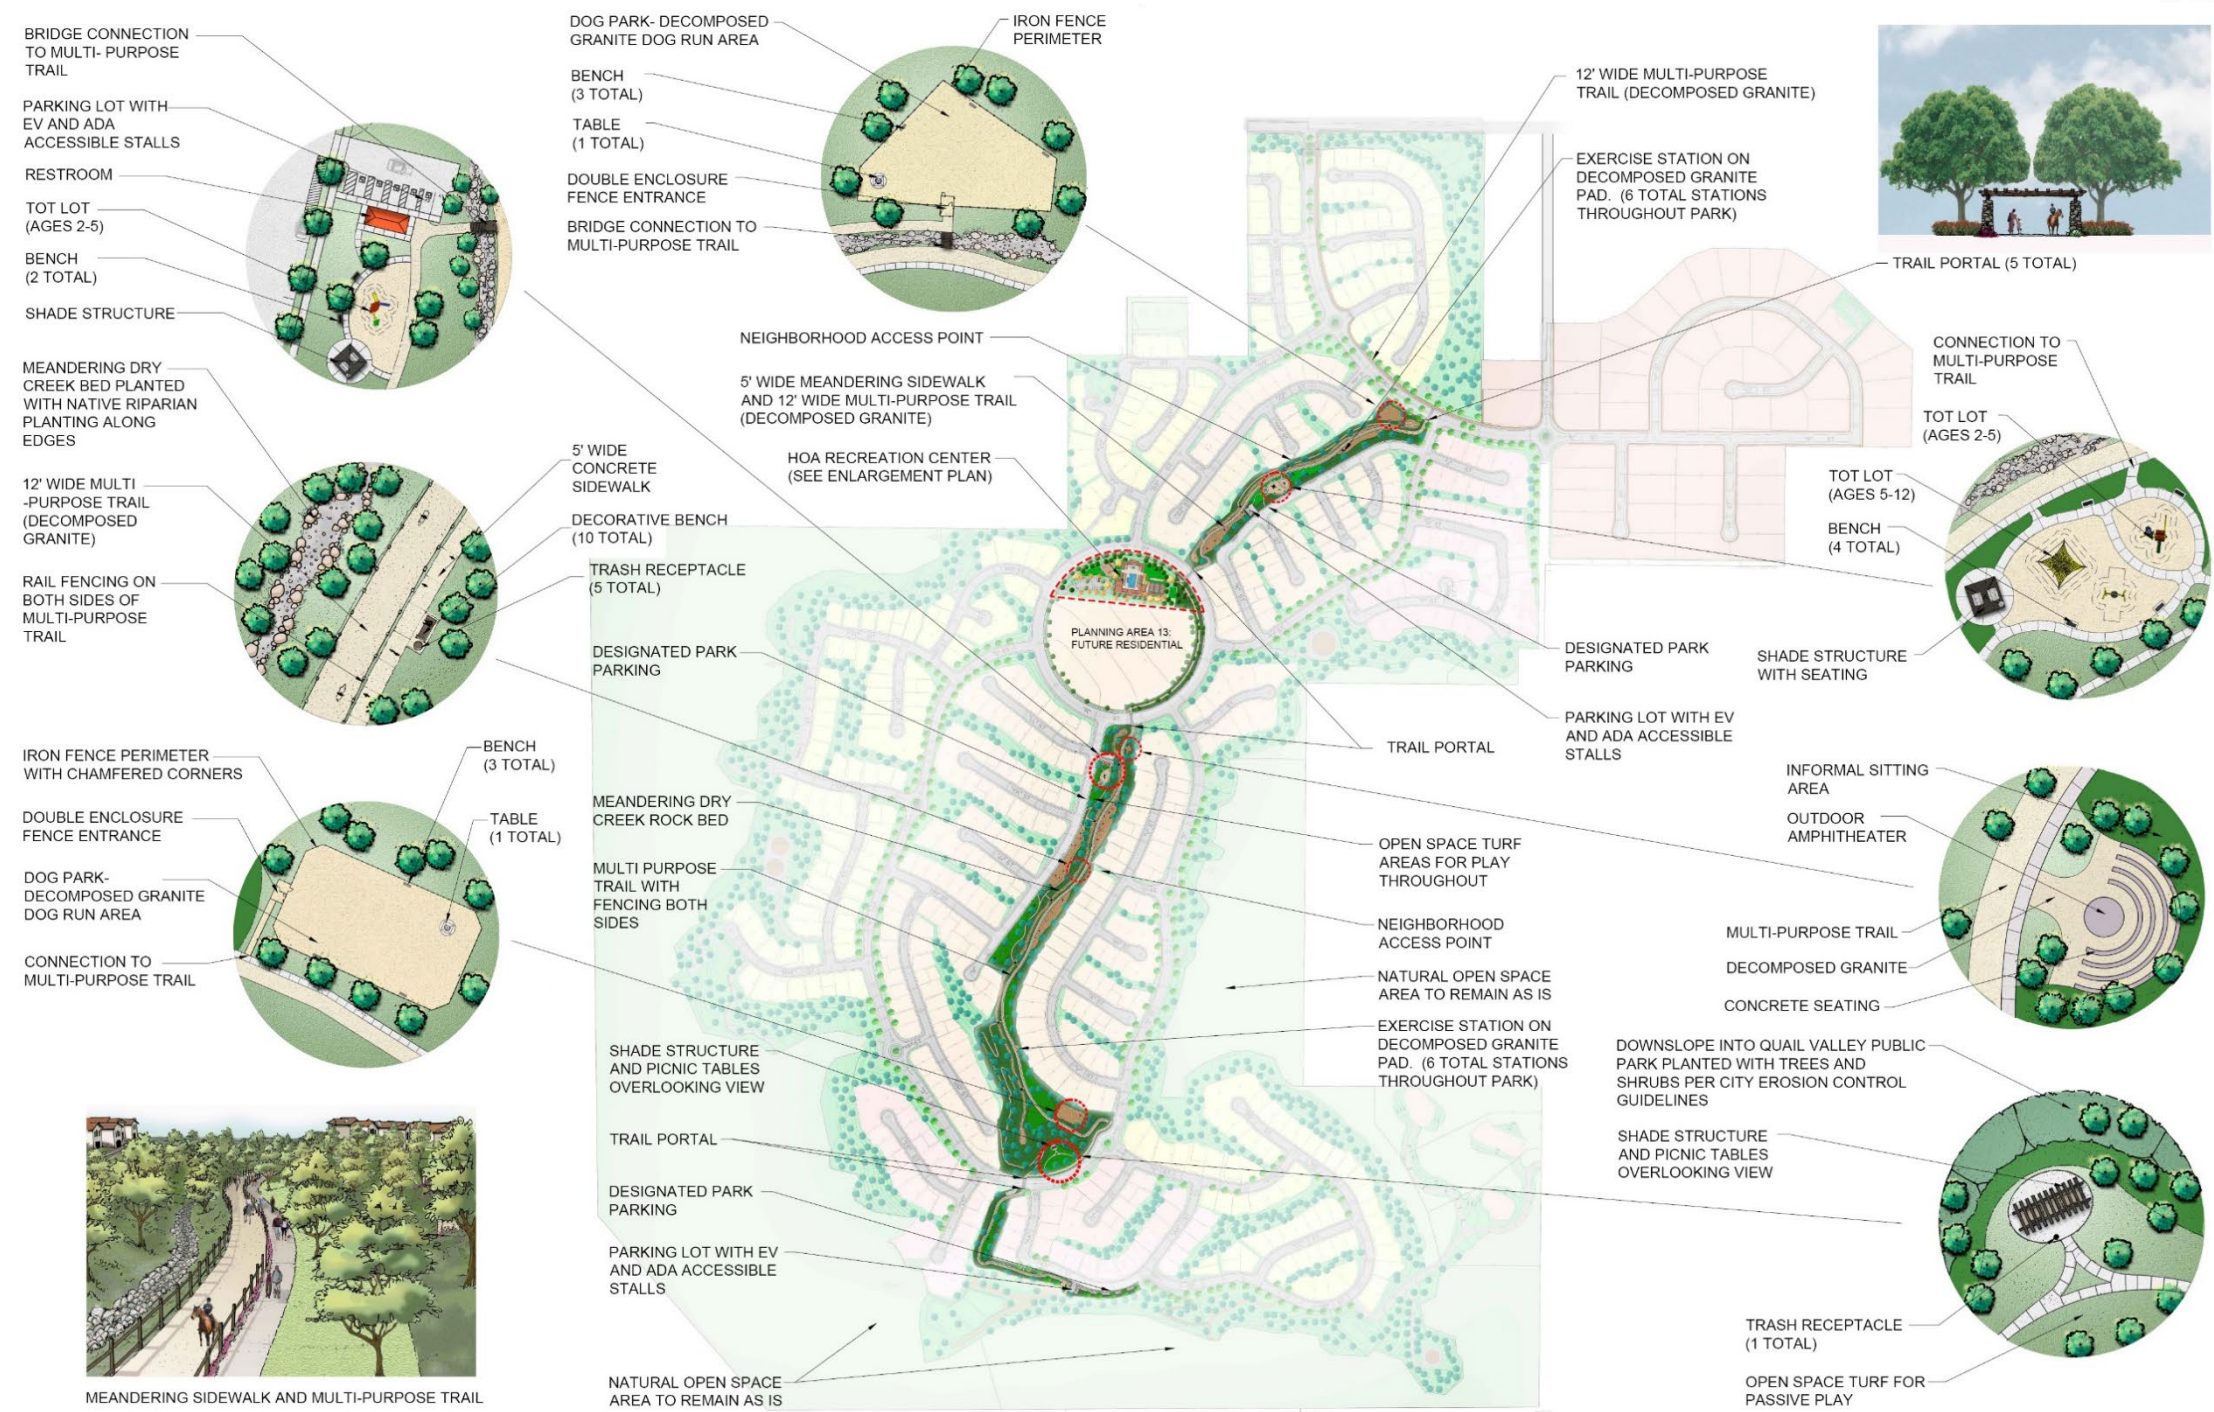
CONCEPTUAL LANDSCAPE PLAN
